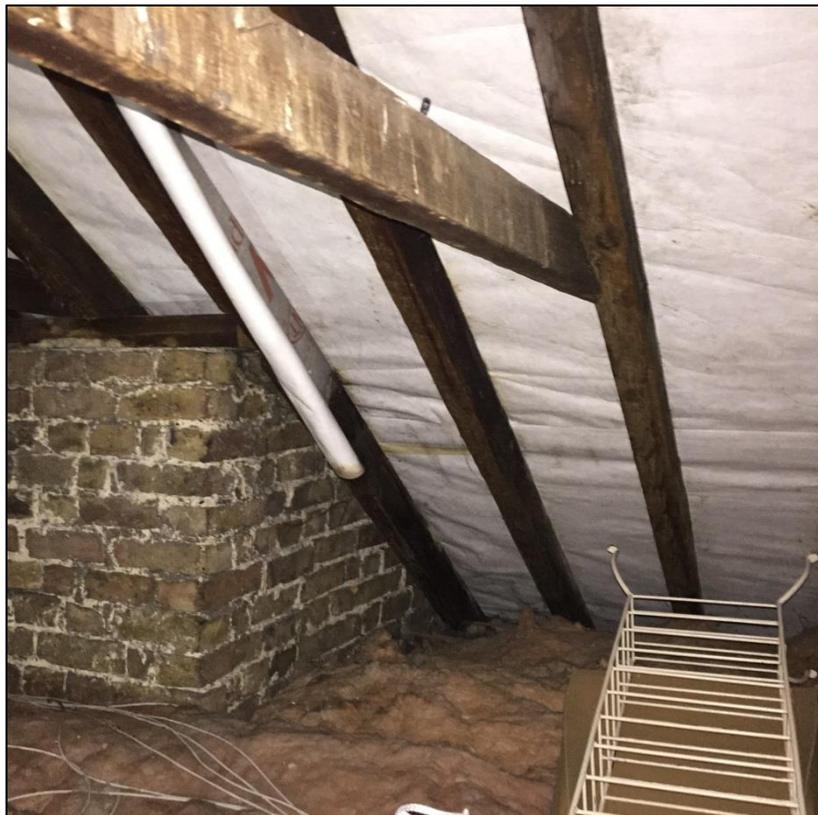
(above): Interior of eastern (rear) roof at junction of part of the rear wall where the roof extends further to the rear with modern waterproof membrane over the timbers of the roof. Confirming much of the 'exterior' fabric is late 20th Century alteration/roof replacement.
